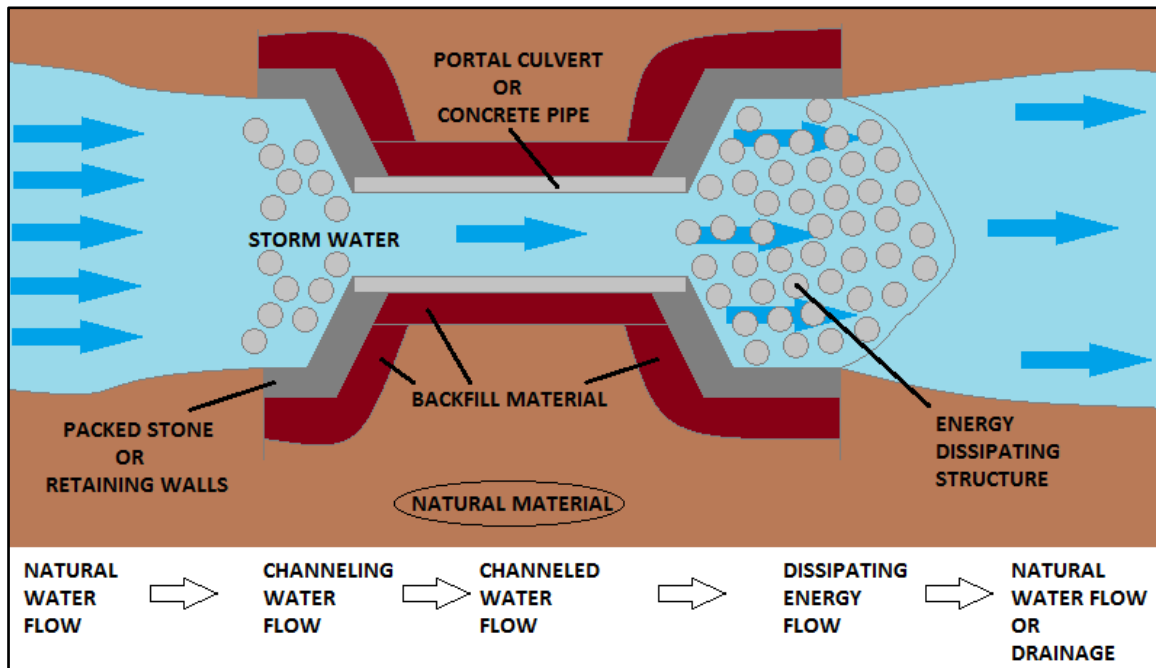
Schematic example of typical drainage line crossing (Solek, 2014)
